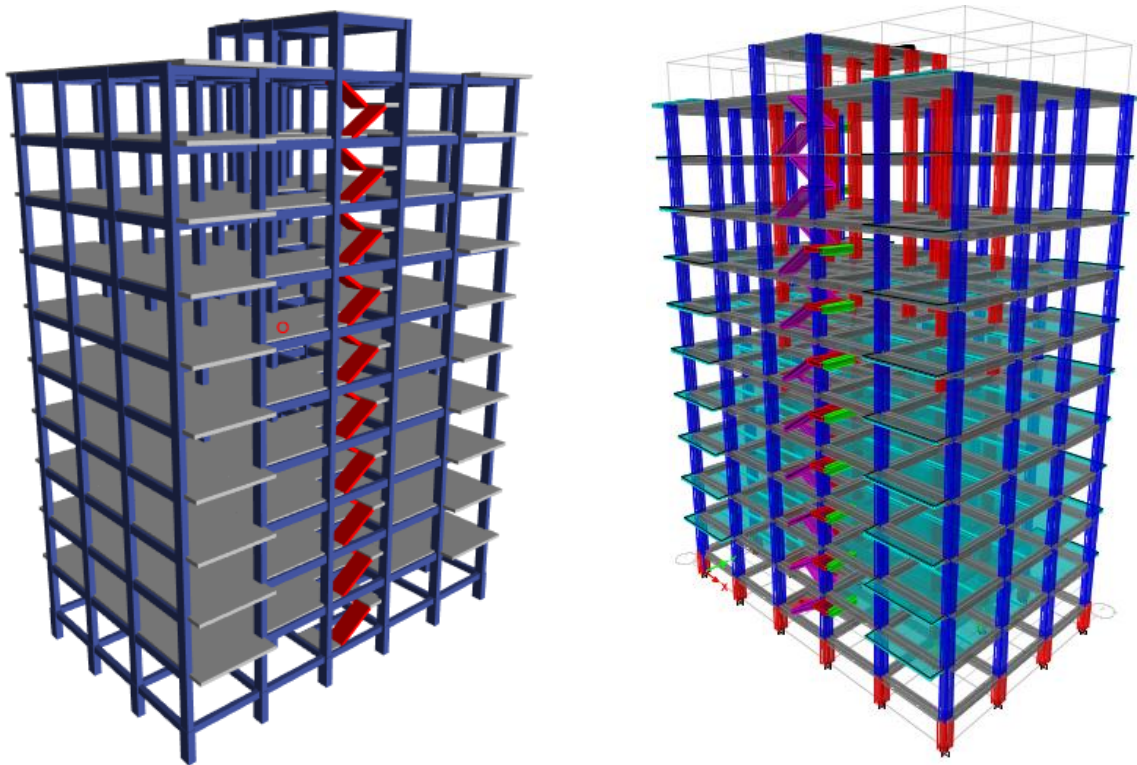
3D Model of 10 storied Residential building without shear wall
